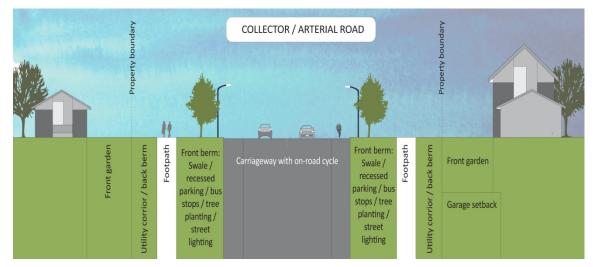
Collector/arterial road cross section showing separation of services and street planting zones.
